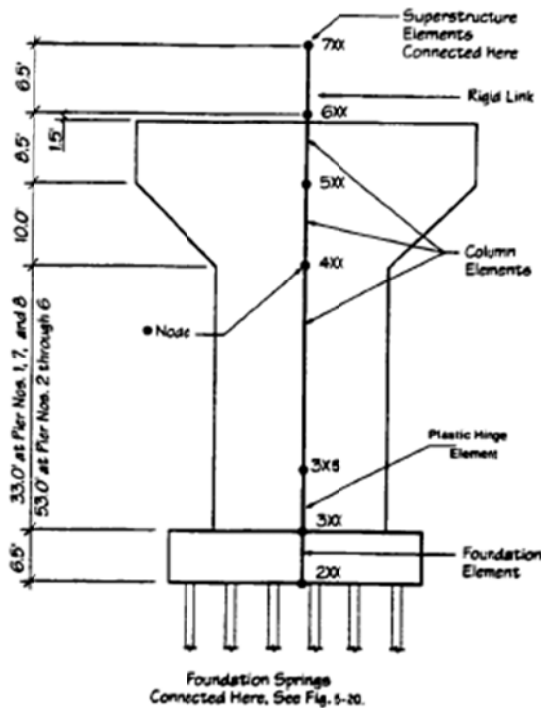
Bridge No. 1 – Details of Pier Column Elements
